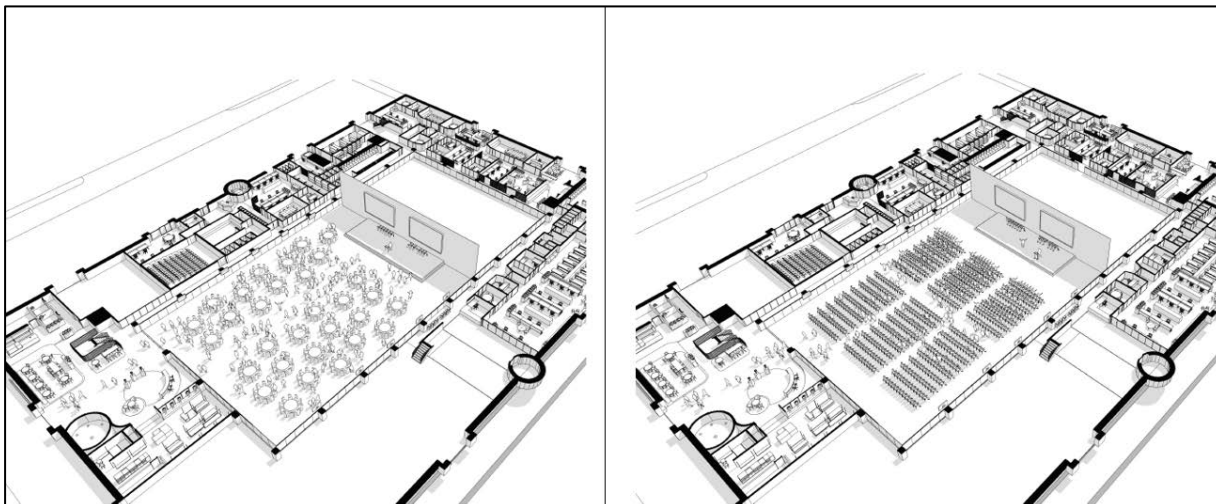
| Illustration of the central multipurpose space and possible event configurations (Source: Applicant's Design Report)
